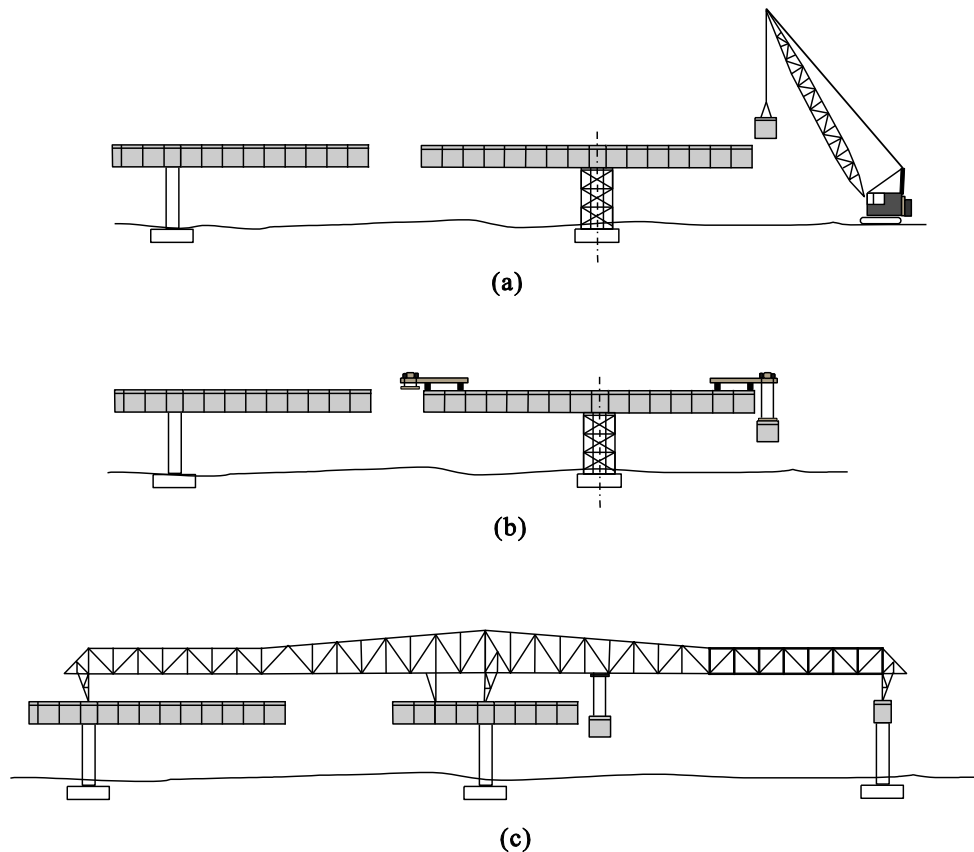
Typical precast balanced cantilever erection methods: (a) Crane placing, (b) Beam and winch method and (c) Launching gantries [Podolny, Muller 1983]
